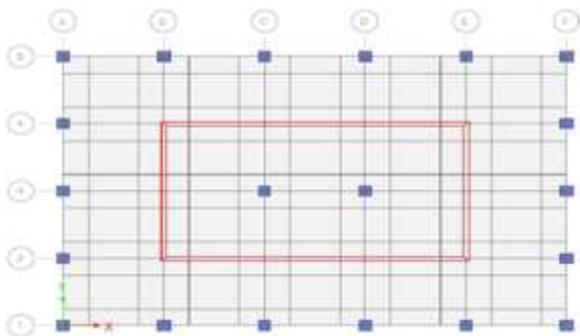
PLAN - FLAT SLAB WITH LIFT CORE- SHEAR WALL
